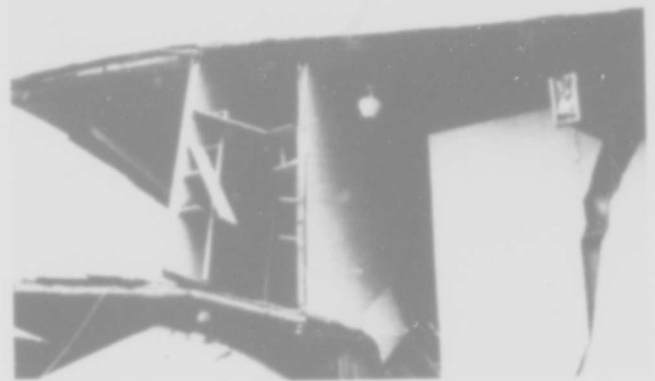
Both roof and wall rigidity prevented major damage to this house.
